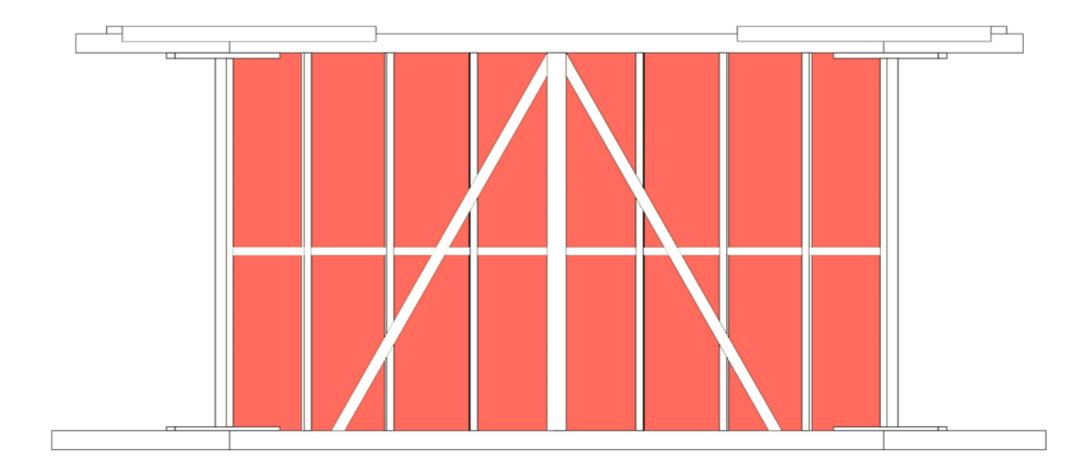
1:20 post -fire measured survey - wall boarding (H) indicated in dome wall interior elevation (2020) © SLHA
